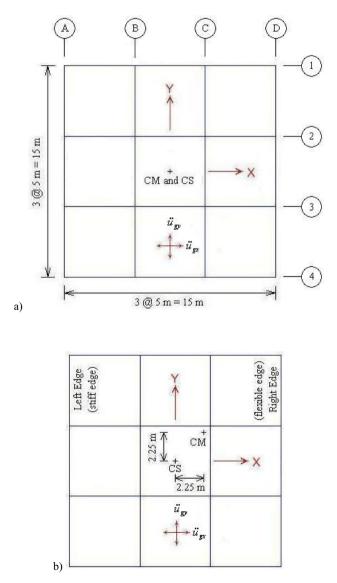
(a) Plan of the original symmetric-plan buildings [19]; (b) Plan of the created double unsymmetric-plan 4 and 10-storey buildings
